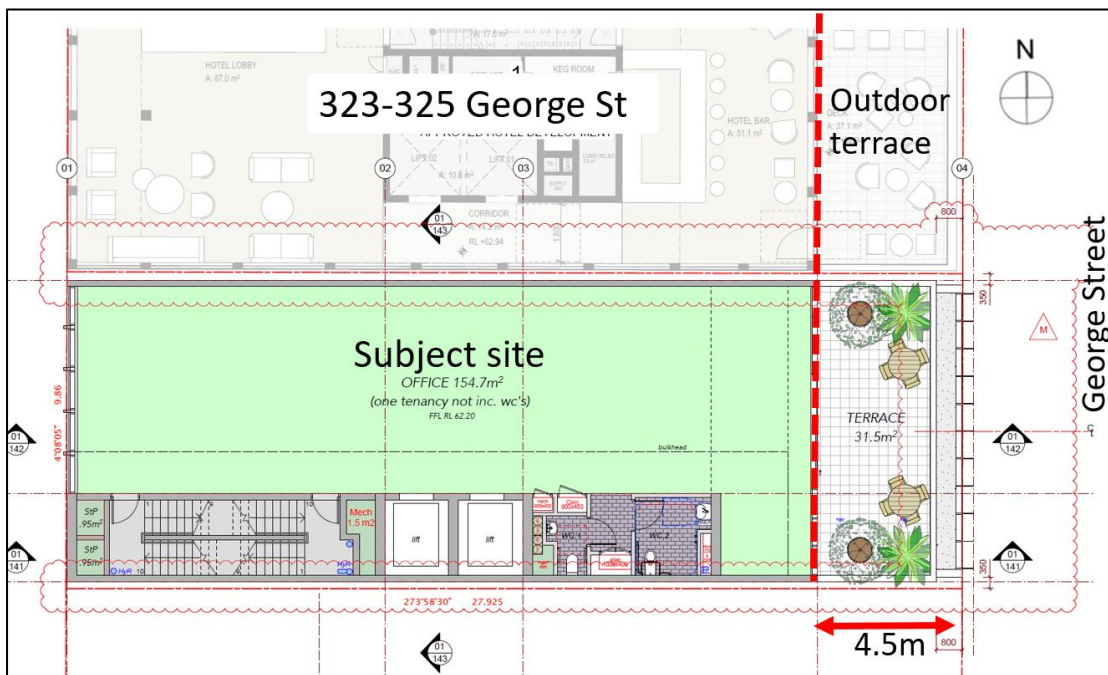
Level 13 floor plan of the proposed development and the approved hotel development of
